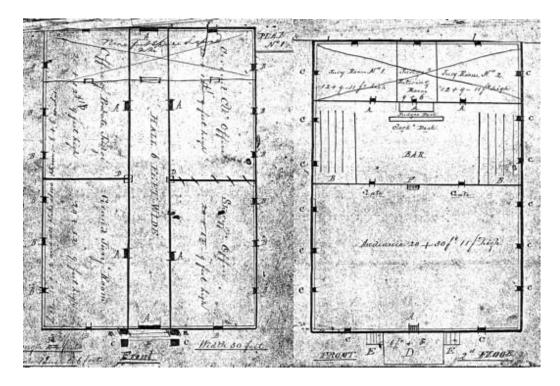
Plans for the first floor (left) and second floor (right) of the 1876 courthouse in Graham's Plan No. 1. (Pine Level folder, Manatee County Historical Records Library, Bradenton, Florida)
